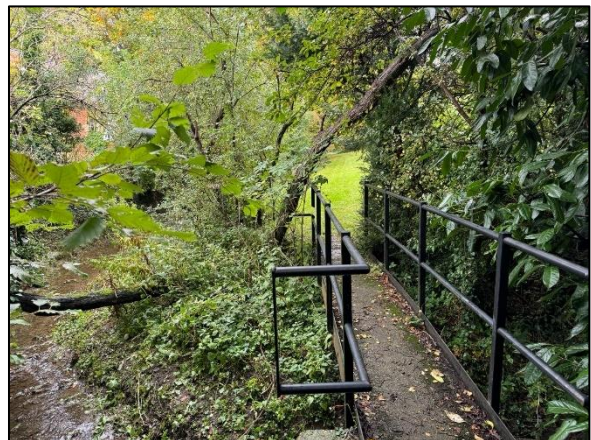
Public Right of Way with a bridge over the River Ave, to the south of Aveland Way
